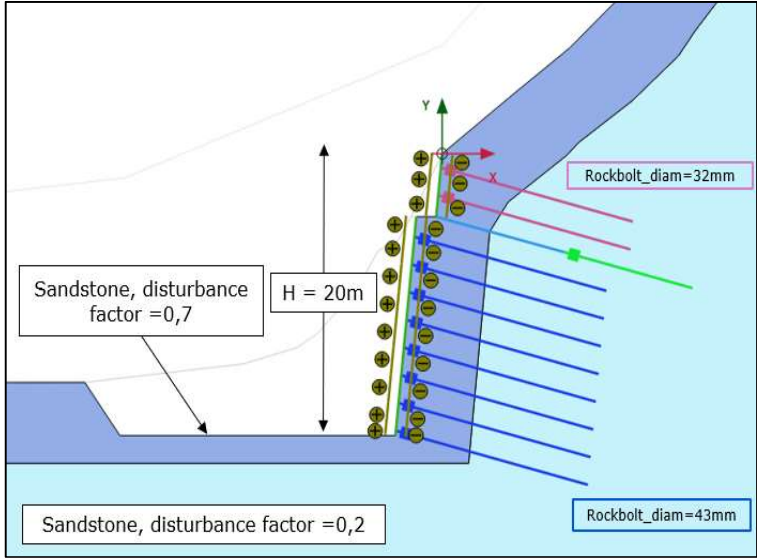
Plaxis 2D Model Layout - North Section +45.78
